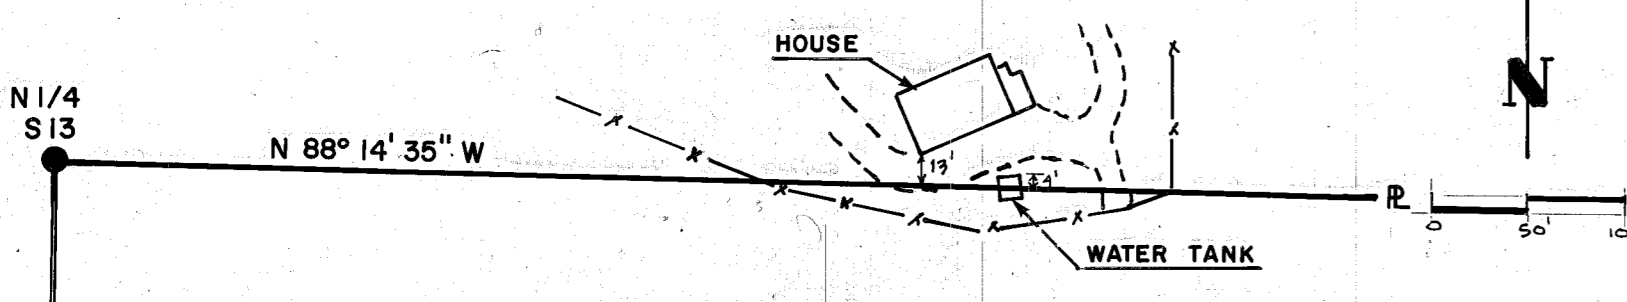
DETAIL OF JOHNSTON CABIN & BUILDINGS
